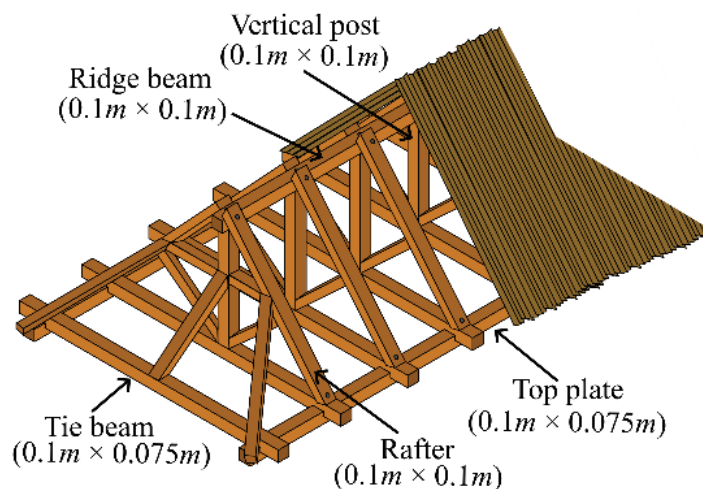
Typical sketch of the roof system in Assam-type buildings
